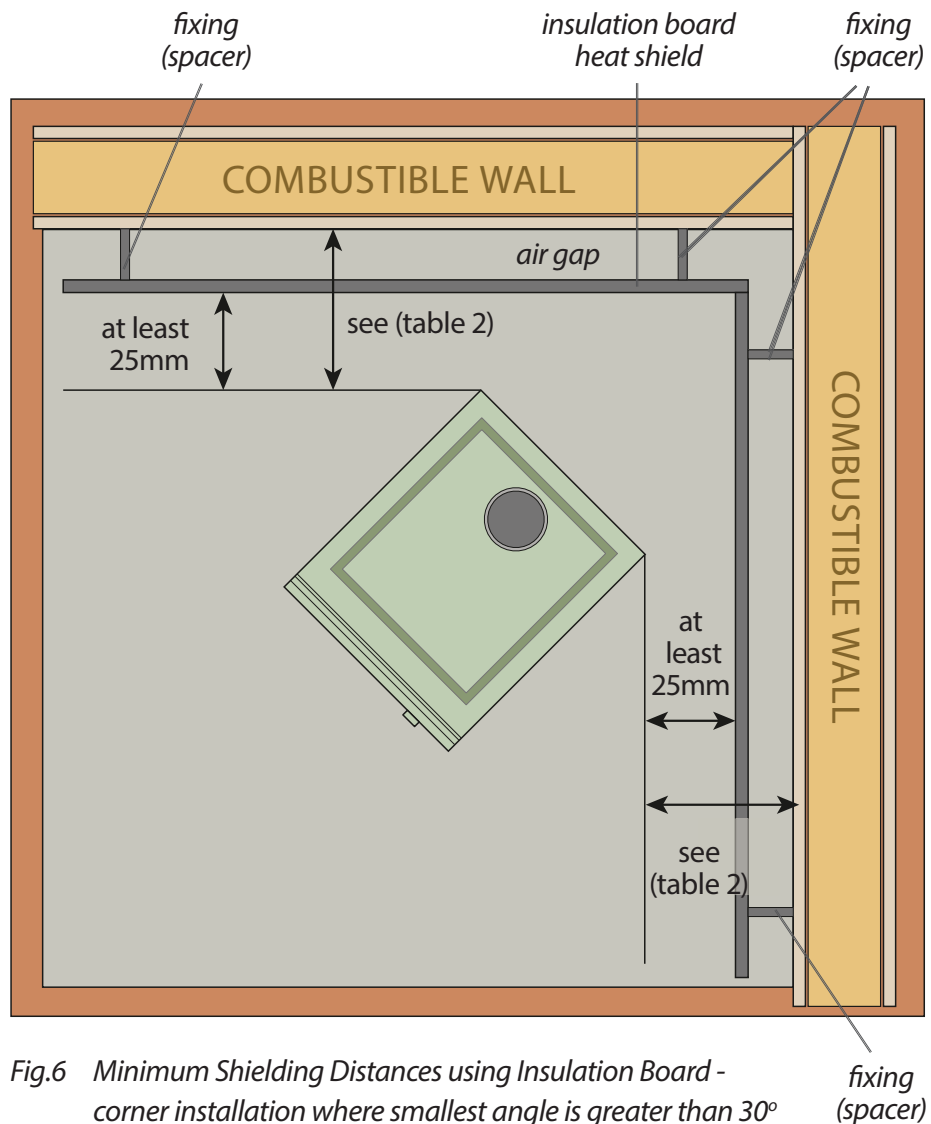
Minimum Shielding Distances using Insulation Board - corner installation where smallest angle is greater than 30°
